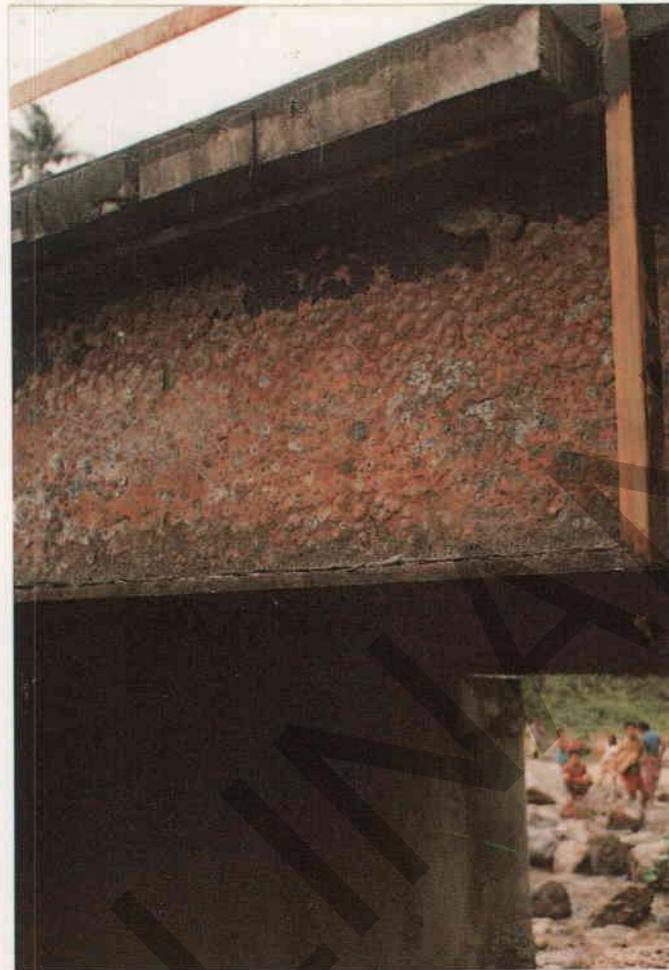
Surface Protection Lost and Minor Corrosion of Steel on the Entire Girder System
